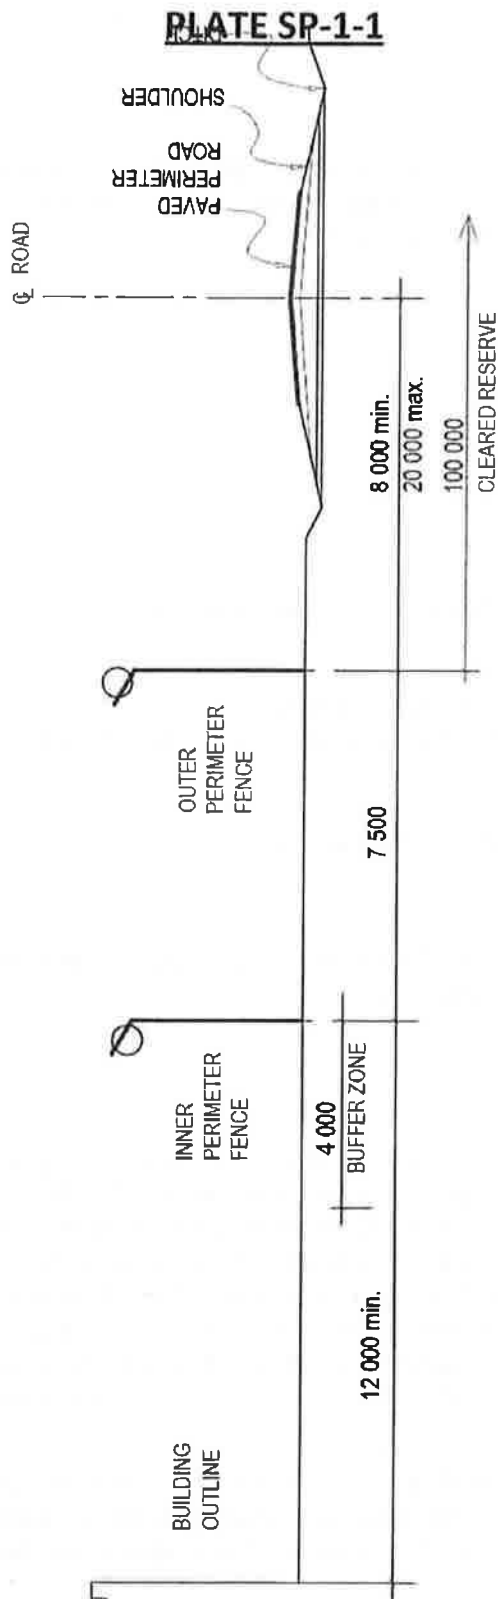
SECTION THROUGH FENCE AND ROAD
